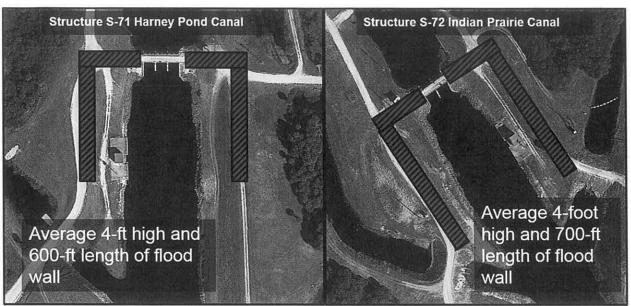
HHD Common Inundation Zone D proposed flood wall.
